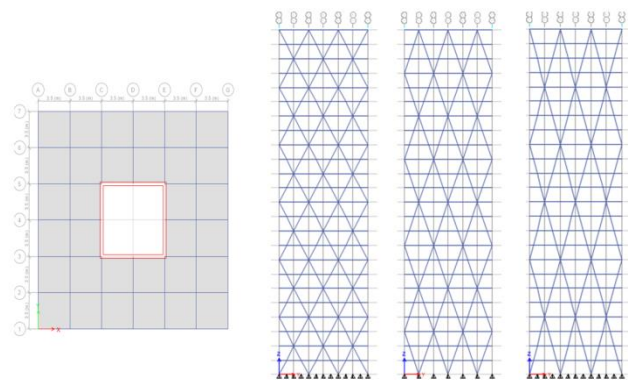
Plan & Elevation of 24 Storey Diagrid Structural System with 4Storey, 6Storey & 8Storey Module variation
